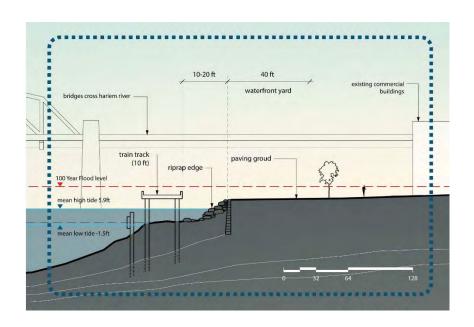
Zoom Cross Section through Harlem River | Existing Condition
